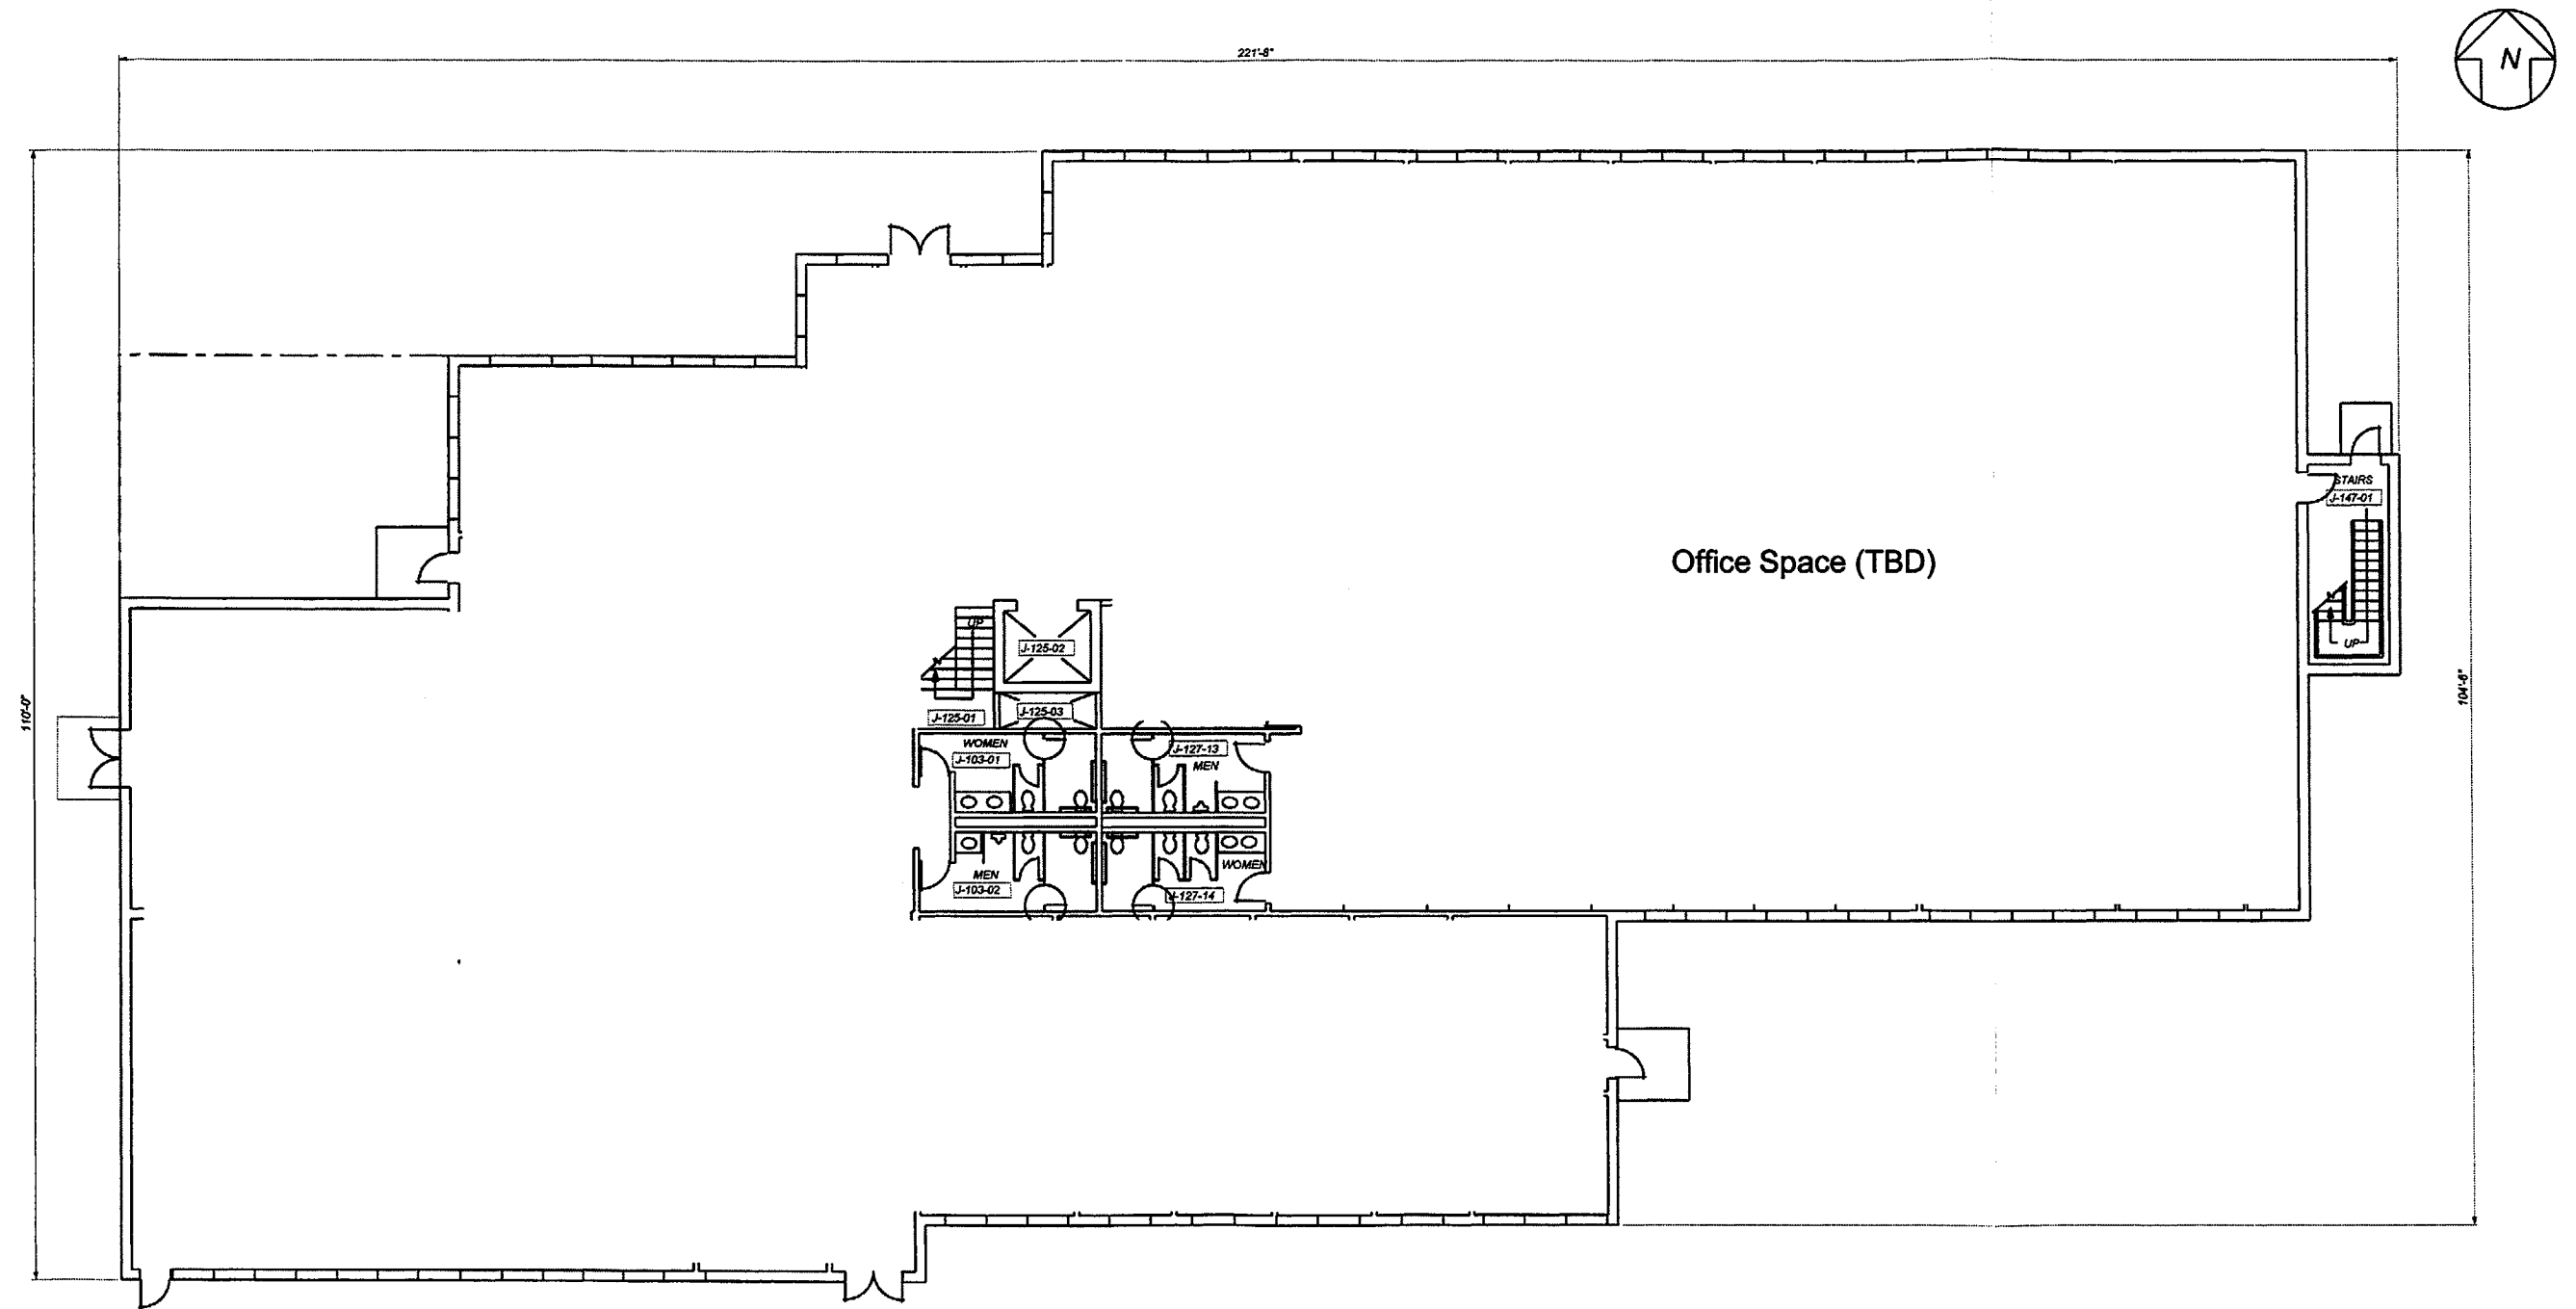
General Arrangement - Administration Building (BAD) - Conceptual Layout - First Floor
